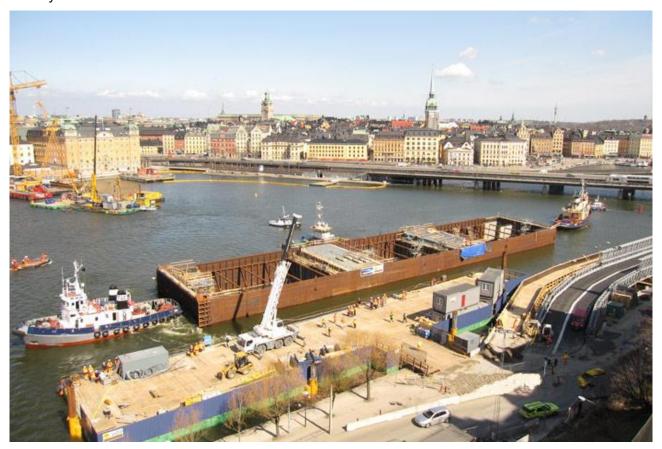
Example of a casting facility for the Soderstrom Tunnel, Stockholm (Source: TunnelTalk, 2013)
